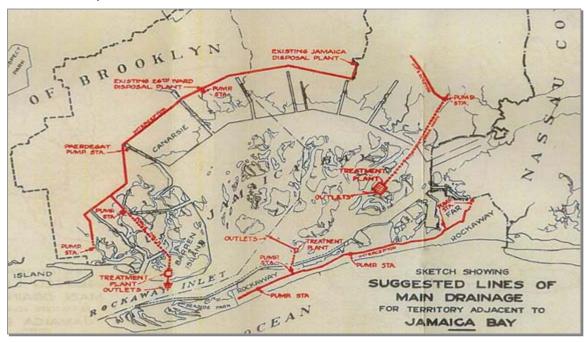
Bay Drainage Plan; Source: Secty. of the Army, 1965
